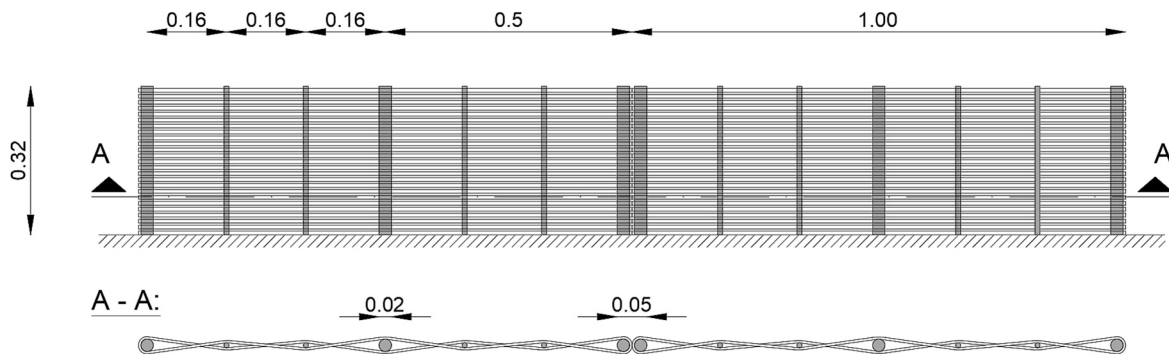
Technical drawing of the restoration facilitator: Front view (top) and top view (bottom). Dimensions in meter.
